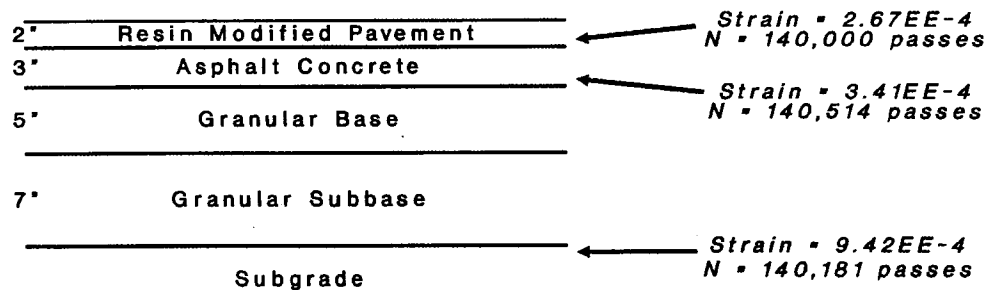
Summary of F-16 asphalt concrete and RMP designs
